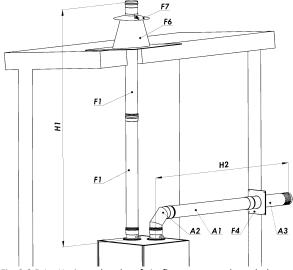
Horizontal outlet of air- flue as system through the wall or on the roof
